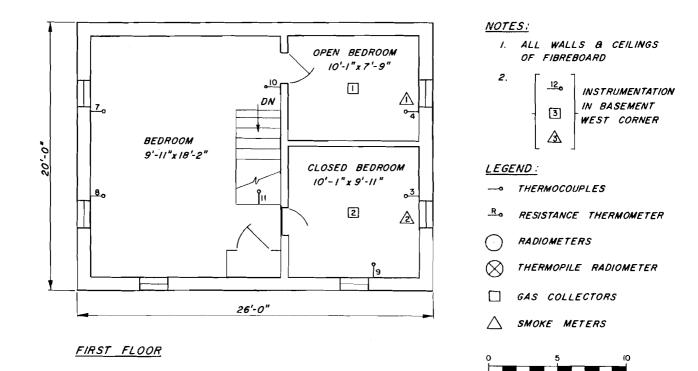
BUILDING No. 3 - TWO - STOREY SOLID BRICK DWELLING
